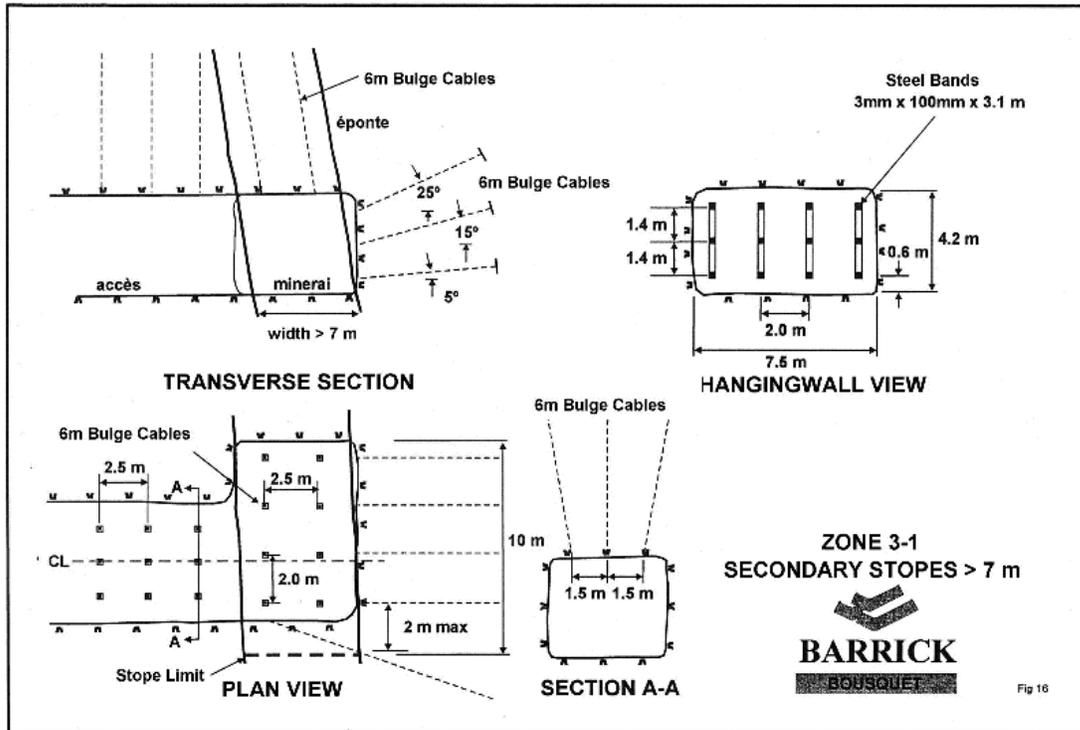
11 Revised cable layout for secondary stopes [After Gauthier, 2000]
